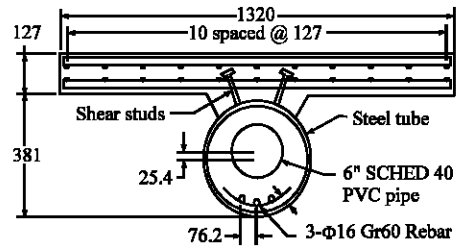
Steel tube filled with reinforced concrete (Mossahebi *et al.*, 2005)
